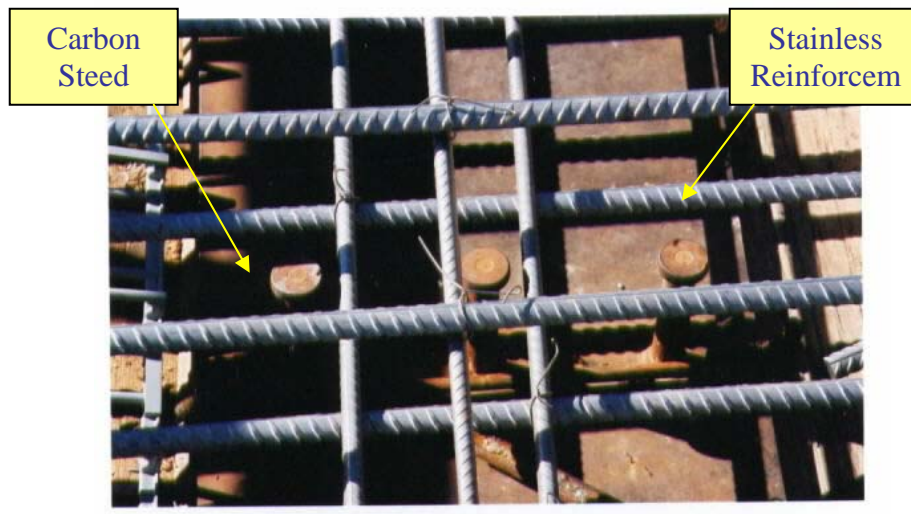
Photograph showing carbon steel shear studs protruding through bottom mat of stainless steel reinforcement.
